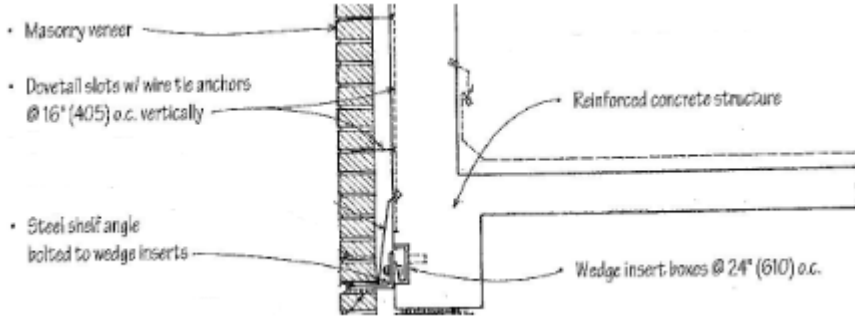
Brick veneer attached to reinforced concrete structure (Ching, 2008)
